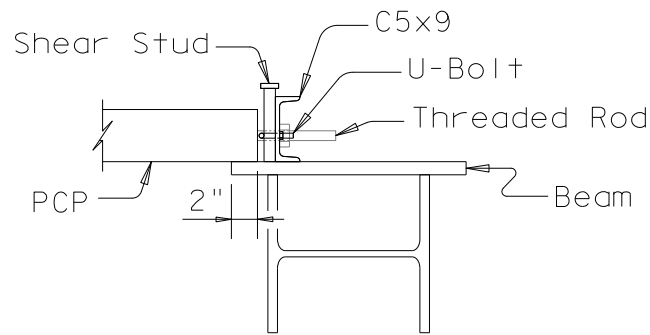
Cross-Section of Shear Stud Connection PCP Specimen
